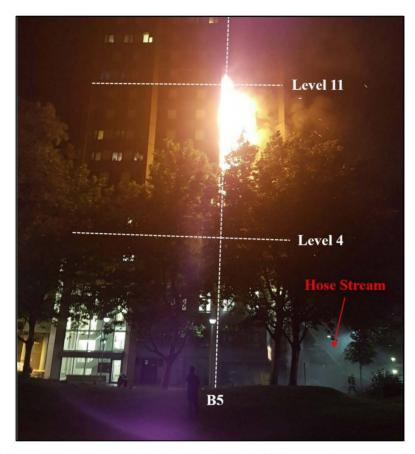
Fire on East elevation of the building envelope at 01:21 on 14 June 2017; Firefighter applying a hose stream to the East elevation (MET00006591)
